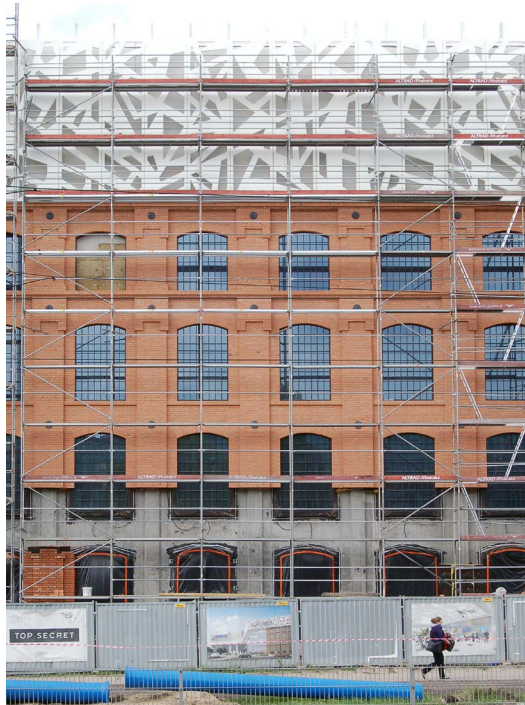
Artificial brick façade being applied to the concrete structure of the shopping mall.
